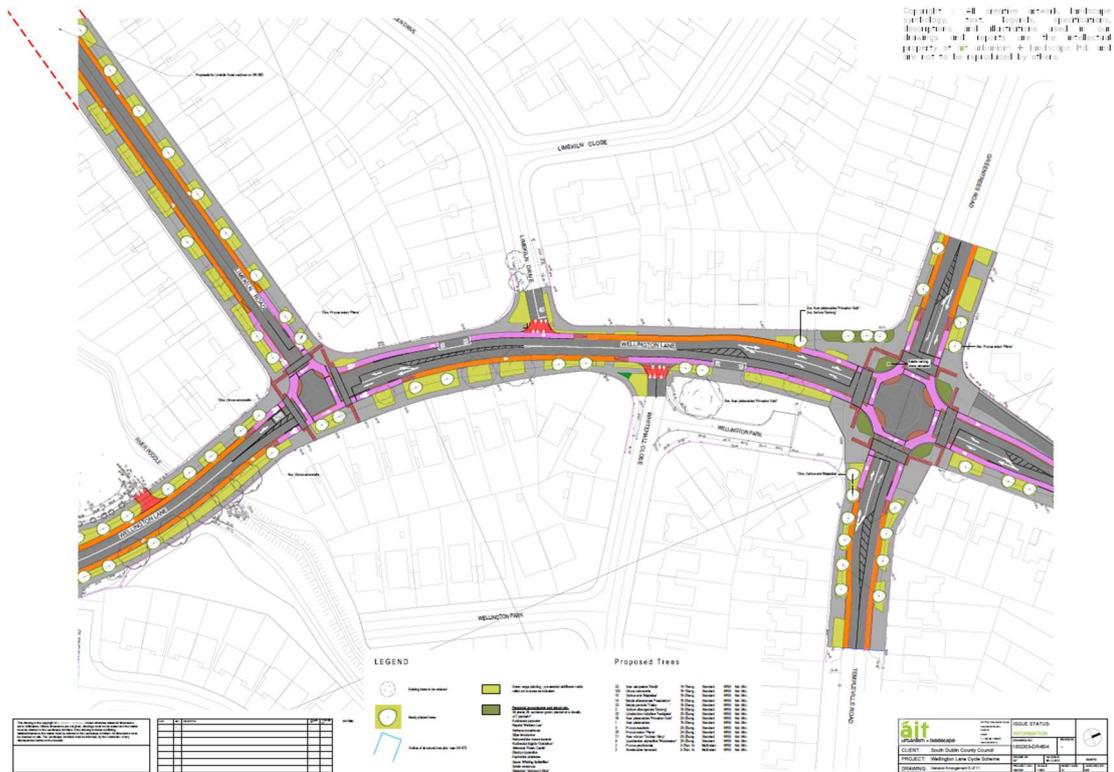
Landscape plan for junction designs under consideration along the route (Source: AIT Urbanism + Landscape)
